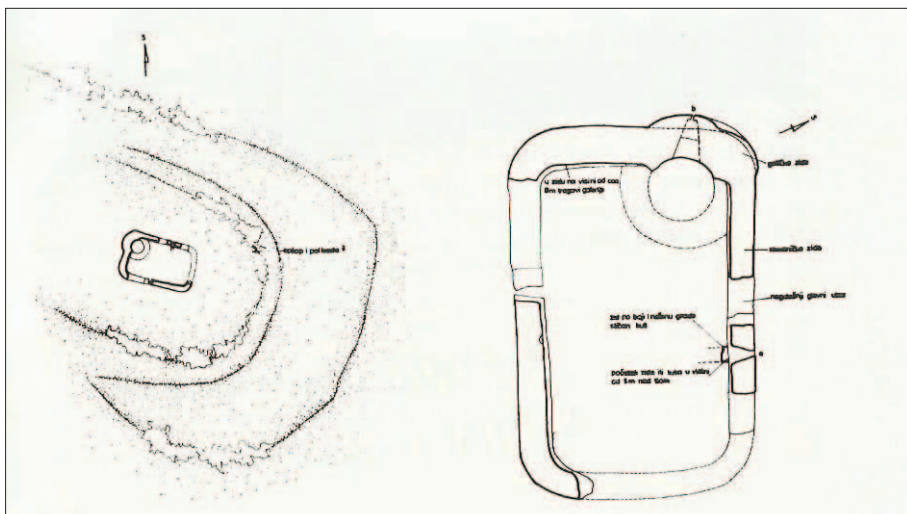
Klokoč, ground plan, Sena Sekulić Gvozdanović, Vladimir Gvozdanović et al., architectural drawing, 1966 (author's archives)
